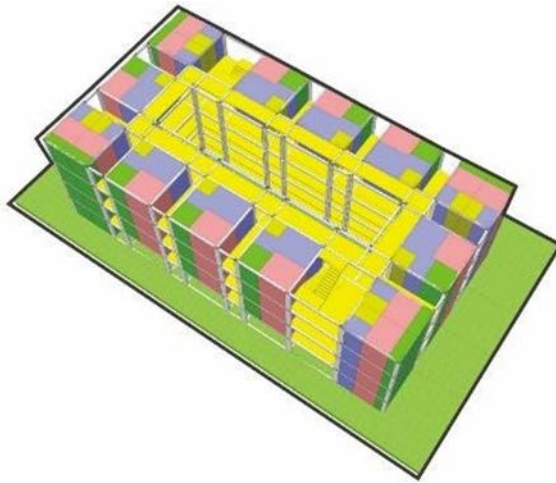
Rusunawa rancacili building, each building consists of various units.
